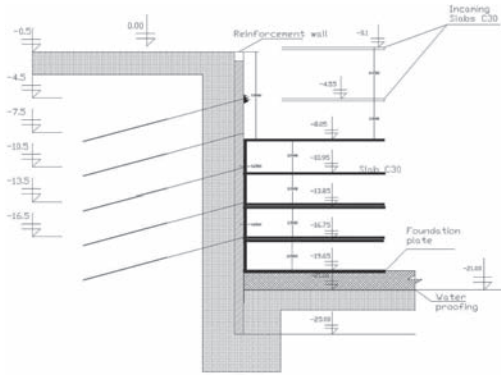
Multi anchored diaphragm wall section AA(left) protecting the excavation.
